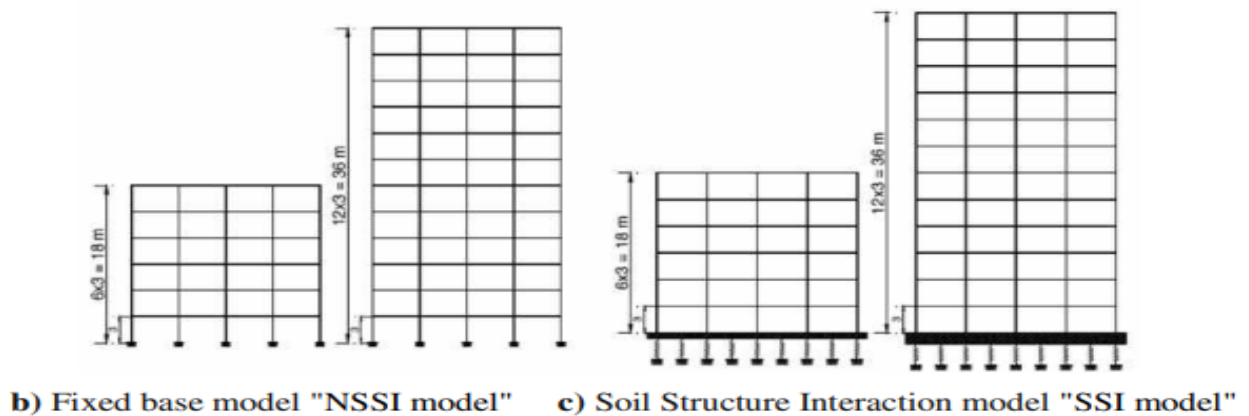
Schematic of 6-story and 12-story buildings' models
